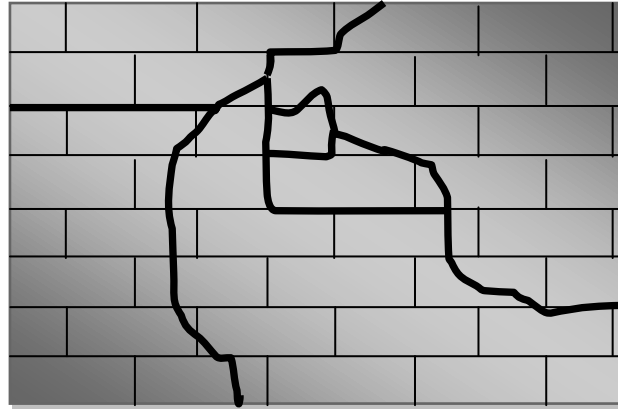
Typical flexural failure of thin bed masonry (Kanyeto and Fried , 2011).
